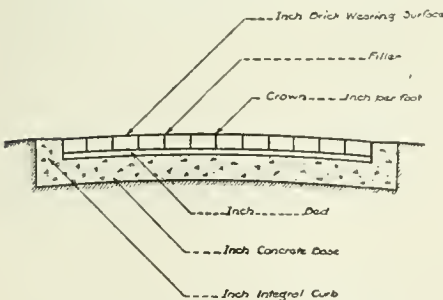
THIS IS A SPECIMEN CROSS-SECTION OF A BRICK PAVEMENT, ON A CONCRETE BASE, FOR COUNTY HIGHWAYS.
